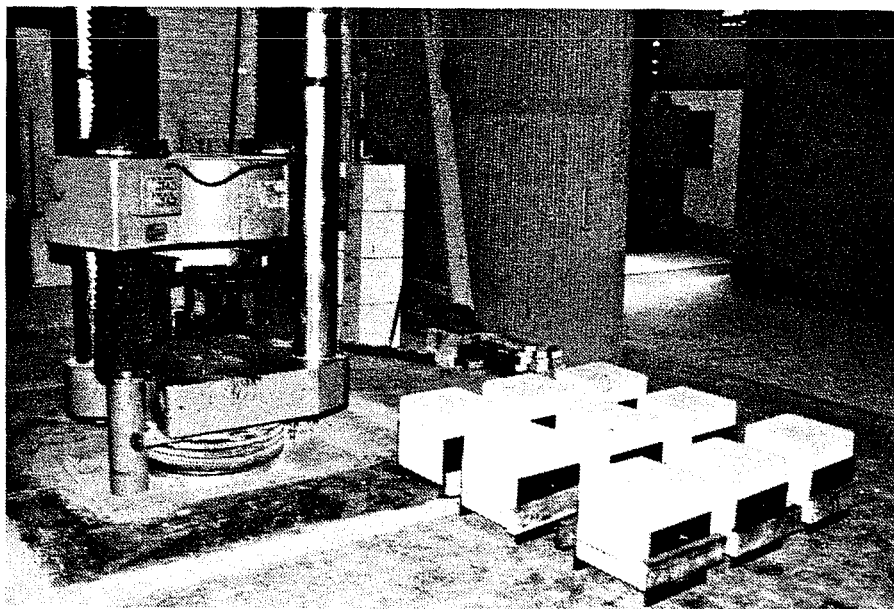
Specimens ready for adhesive application beside universal testing machine
